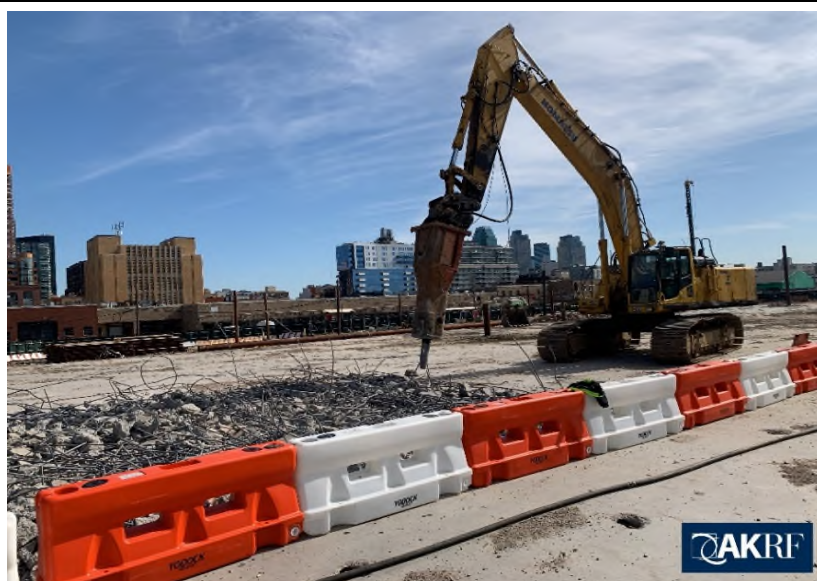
Civetta continues breaking up portions of the slab of the former building, facing south.
